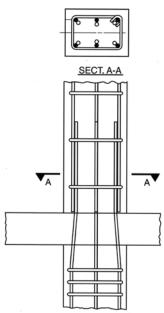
Lap splice location for reinforced concrete columns in buildings assigned to SDC A, B, or C. concrete column based on strength requirements, the size and number of longitudinal reinforcing bars must be chosen to provide an area of reinforcement equal to or greater than the amount that is required, and satisfy the minimum and maximum spacing requirements in ACI 318-14, Building Code Requirements for Structural Concrete and Commentary. Columns that have longitudinal reinforcement ratios in the range of 1 to 2% are usually the most economical because concrete resists axial compression forces more cost-effectively than reinforcing steel. It is usually more economical to use larger column sizes with less longitudinal reinforcement.
